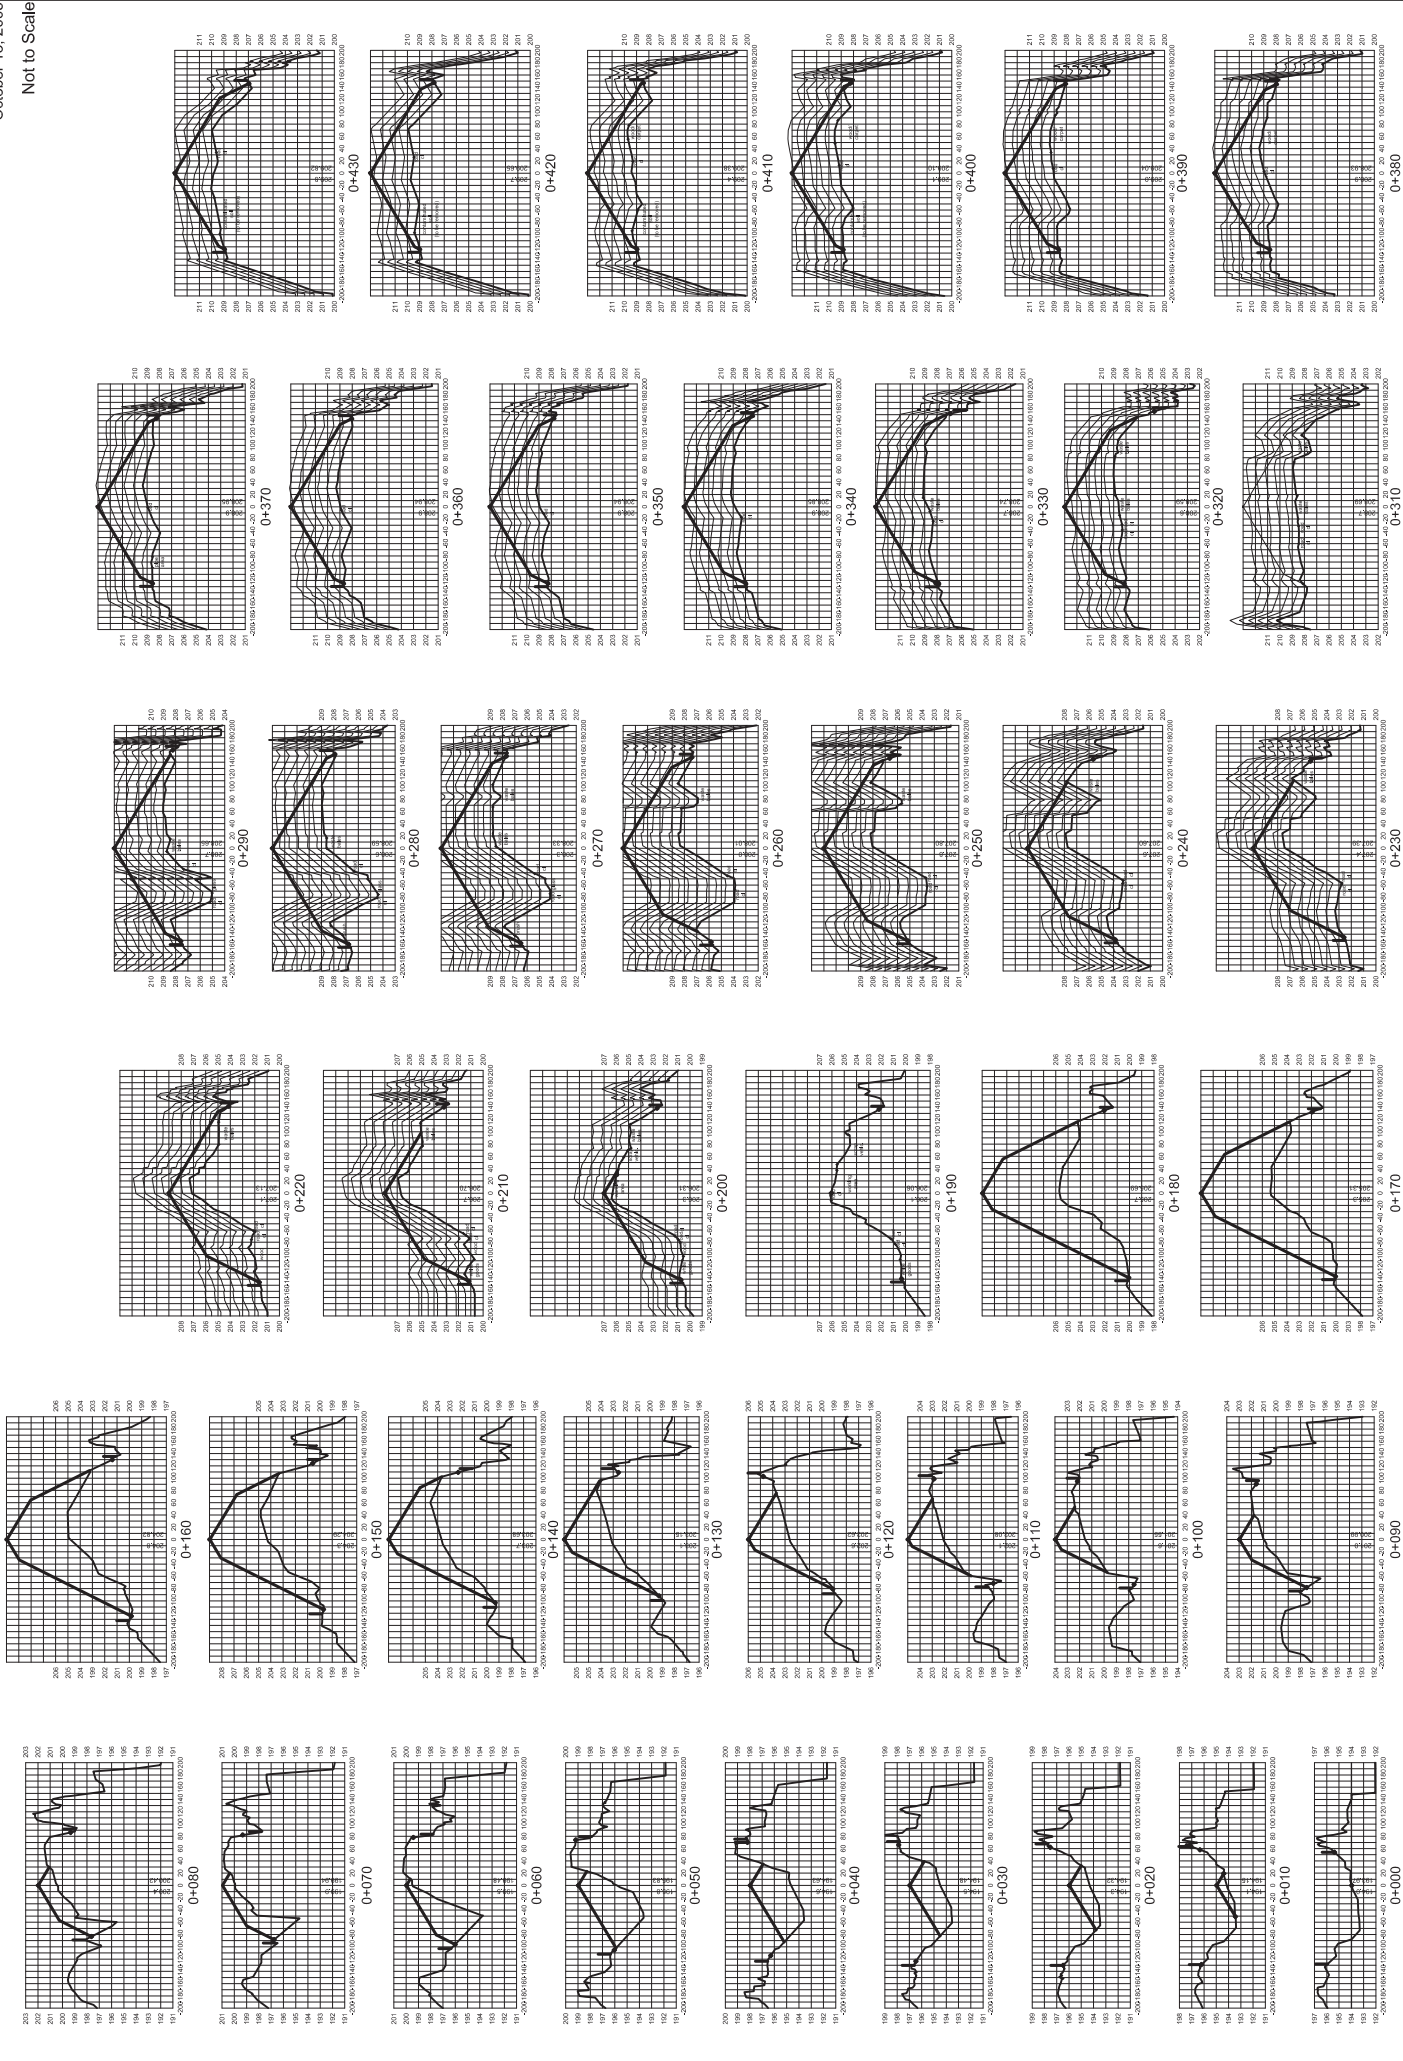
Proposed Top of Waste Fill Contour Cross Sections
